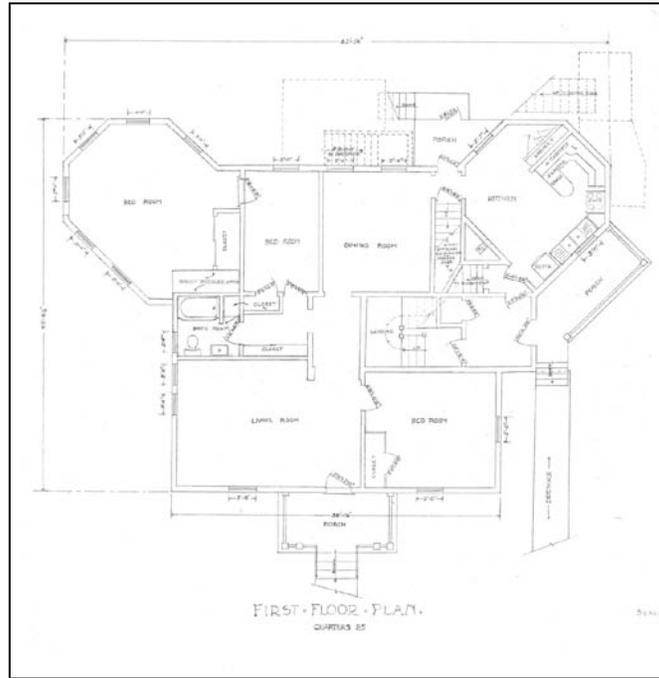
Building No. 25, First Floor Plan after Duplex Conversion
